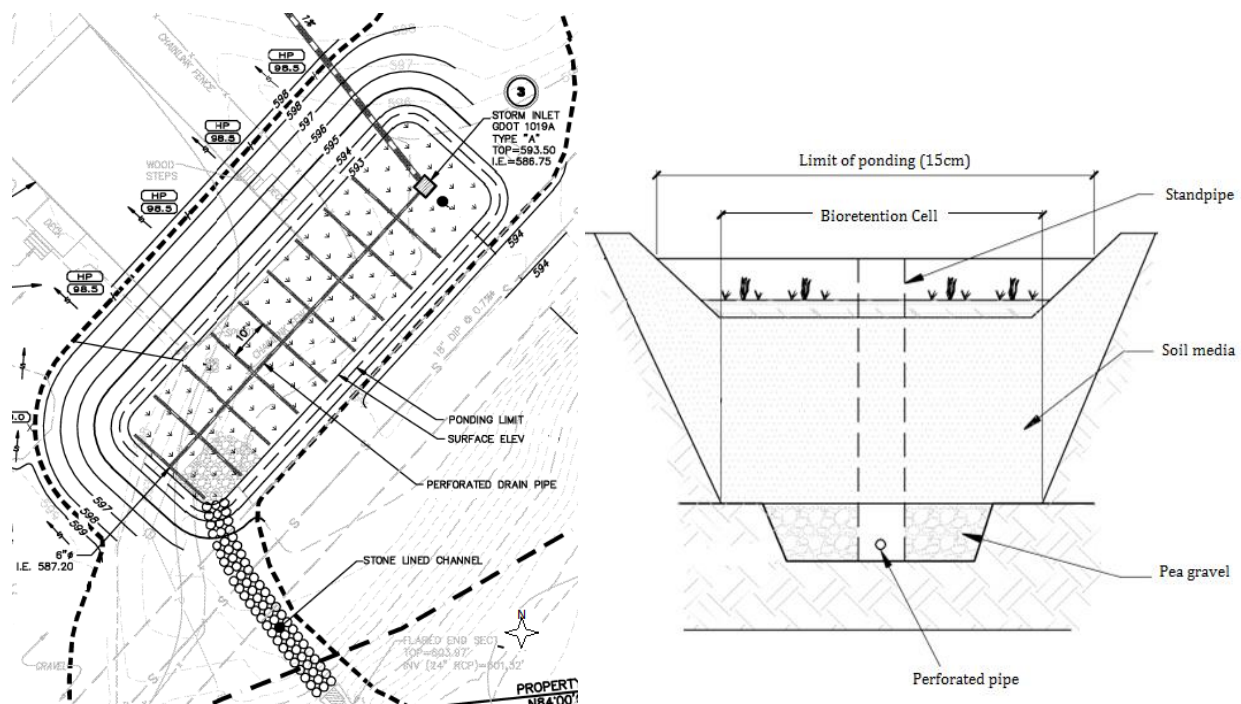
Planform and cross-sectional views of garden (credit: UGA Architects)
